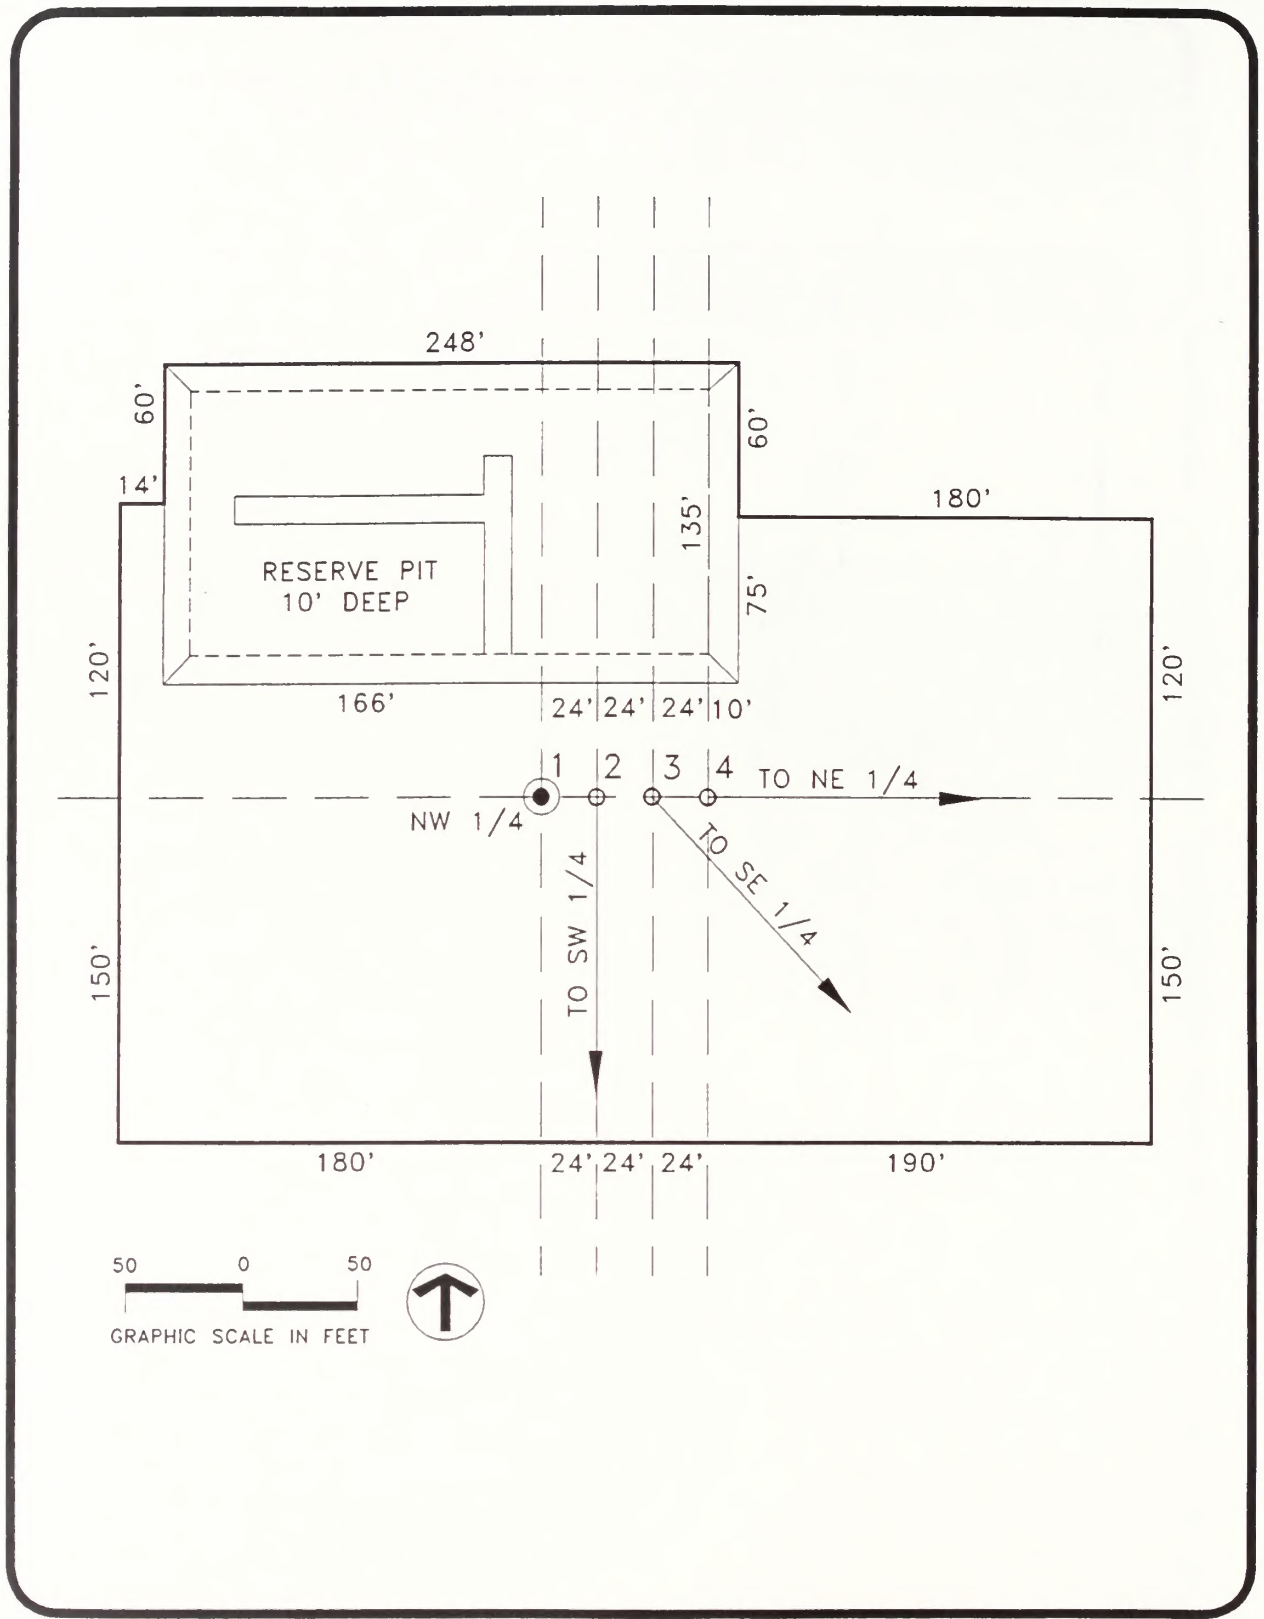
Typical Drawing of a Single Pad/Multi-well Facility.
